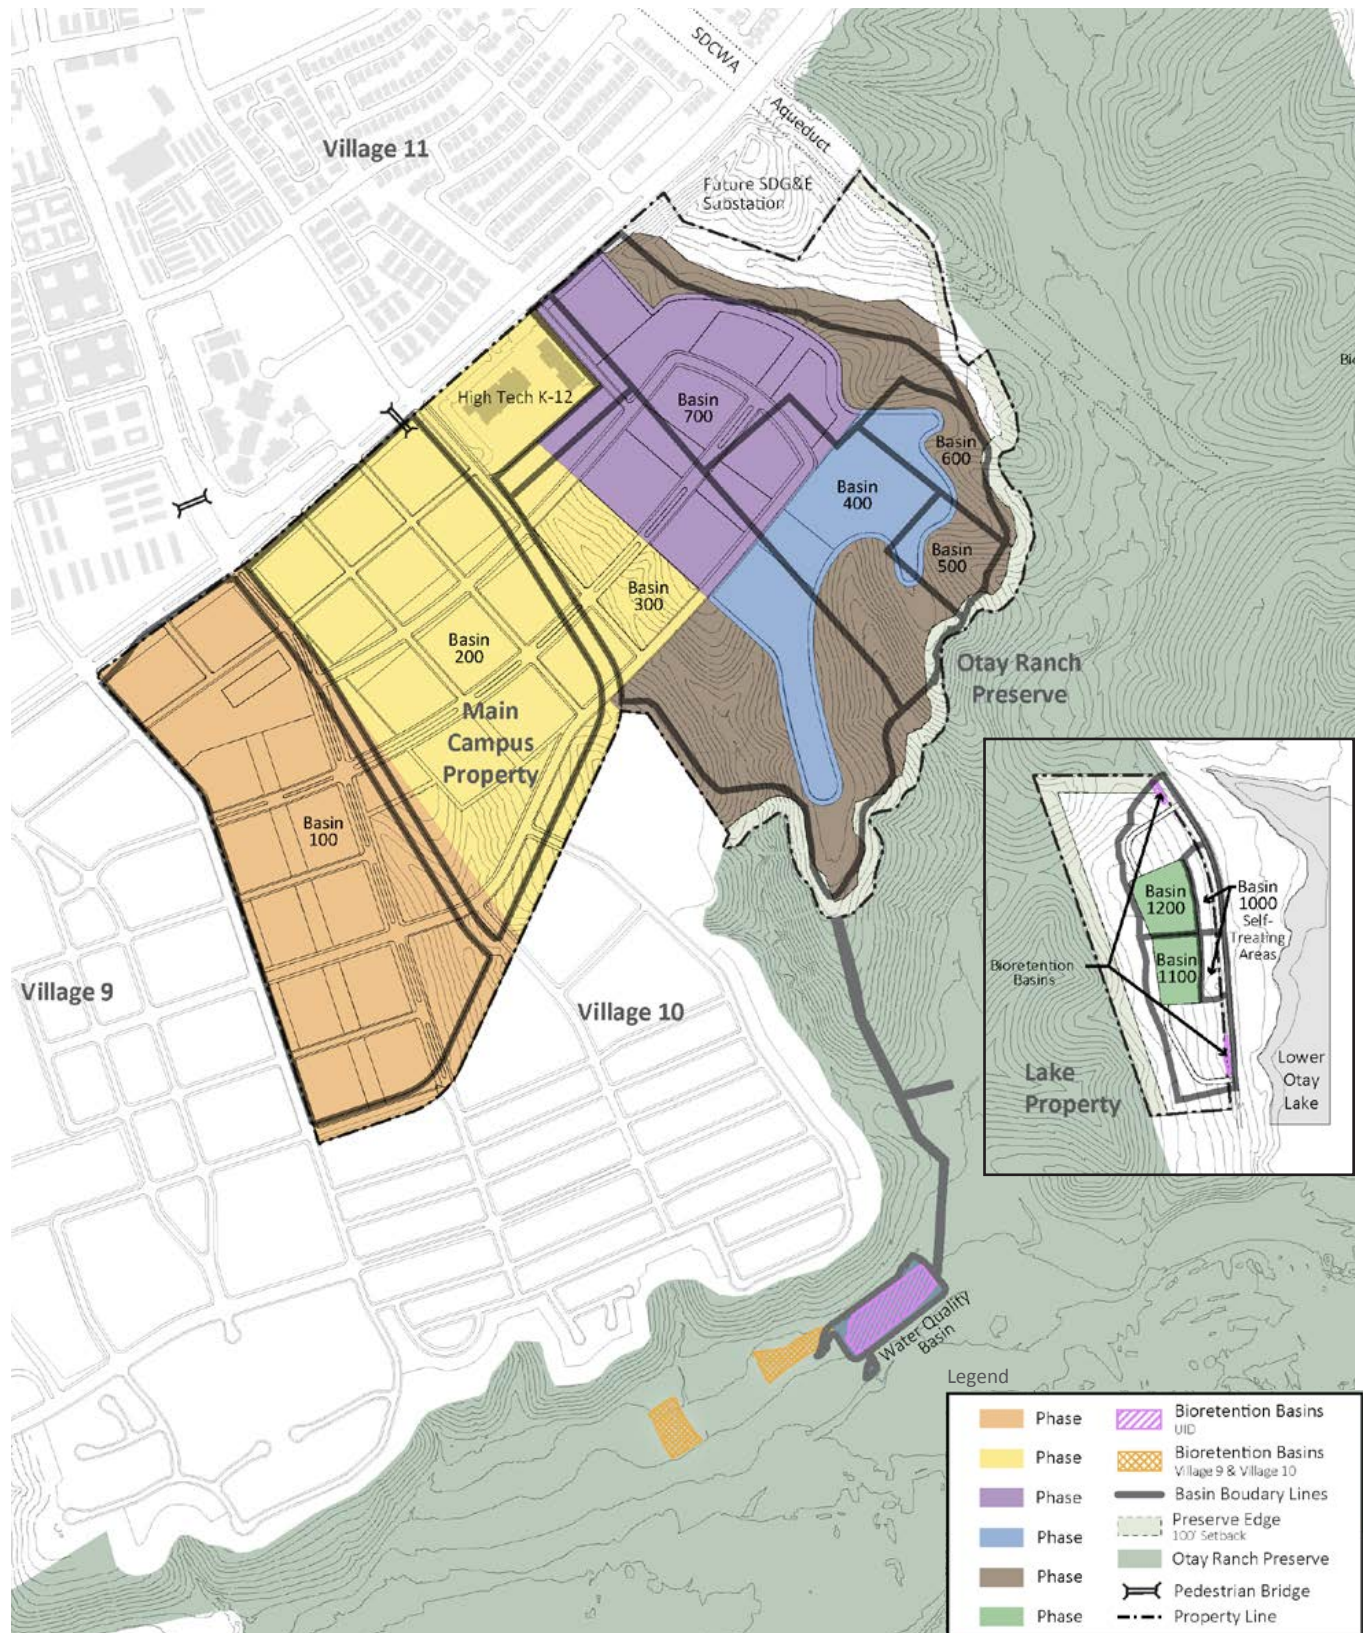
CONCEPTUAL PROPOSED STORM DRAINAGE
